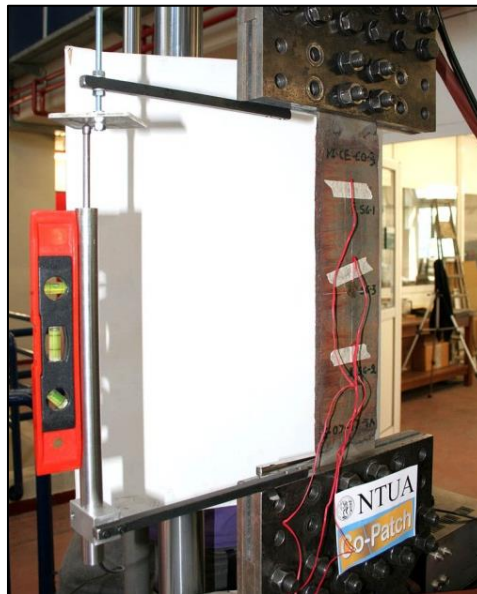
Specimen P2D2A being tested on MTS testing machine.
